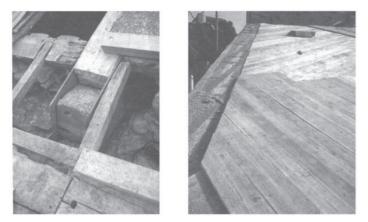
Strengthening the connections with steel ring beams between the wood roof element and the walls. [18]
